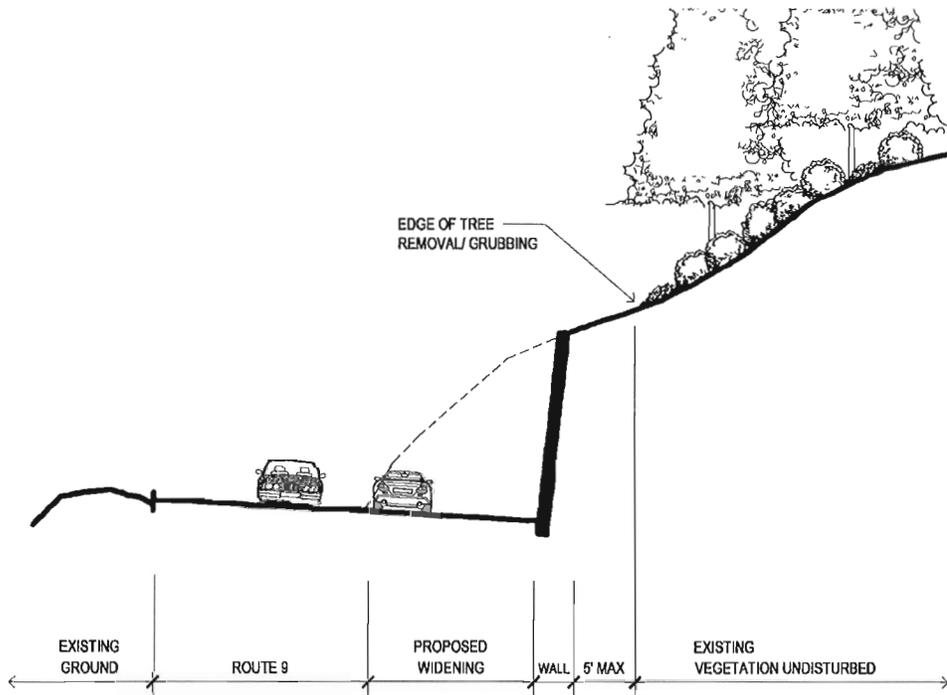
Typical Retaining Wall/ Roadway Cross Section: 10-15 Years Scenario
